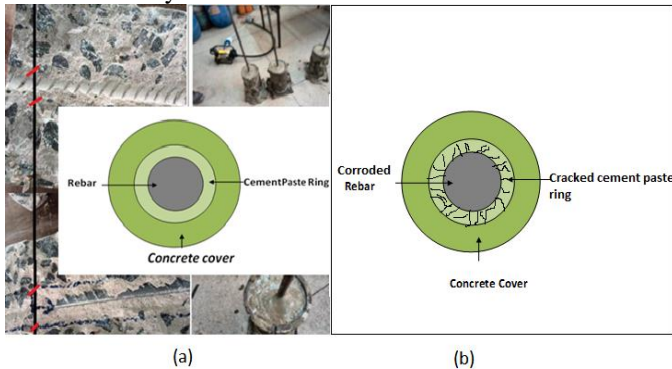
(a) Schematic diagram of cement paste ring: 1(b): Cracked Cement Paste Ring (CPR), R –rebar and C-cover
